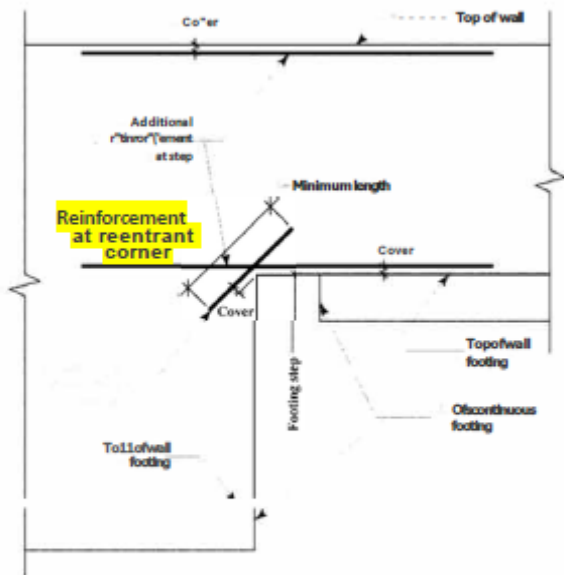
Discontinuous wall footing and additional wall reinforcement.
